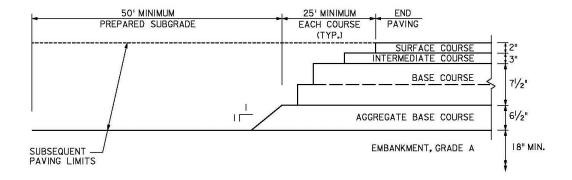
16: TURNPIKE LONGITUDINAL PAVEMENT STEPPING DETAIL
